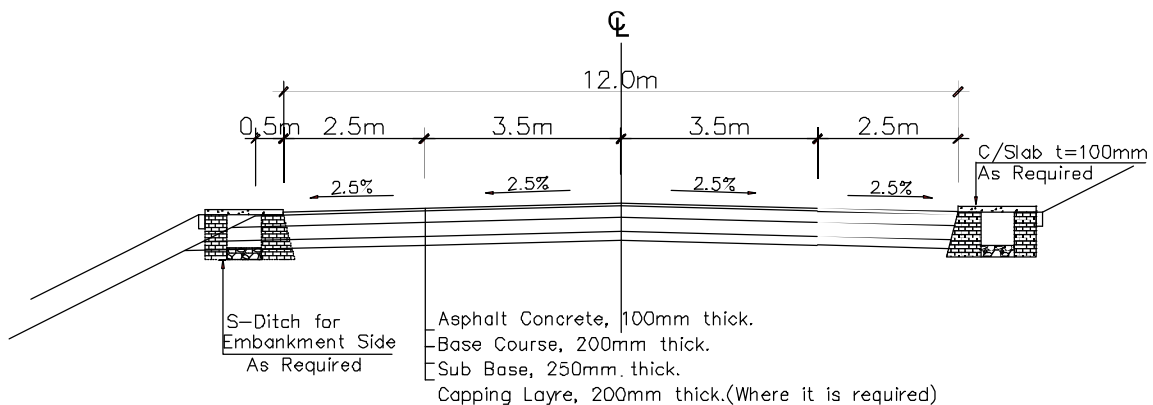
Proposed Typical Cross Section (Kebele Town & Entrance of D/M & End of Dejen)
